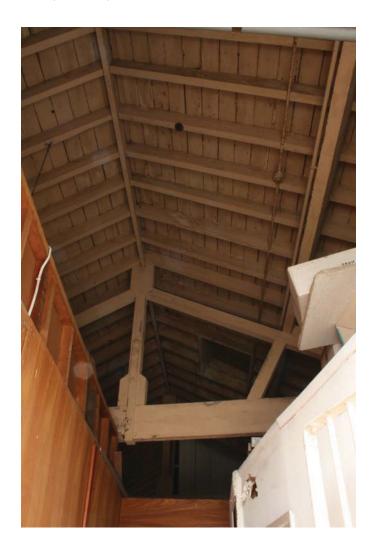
Internal view of Building 4, showing king-post roof truss, looking north-east
